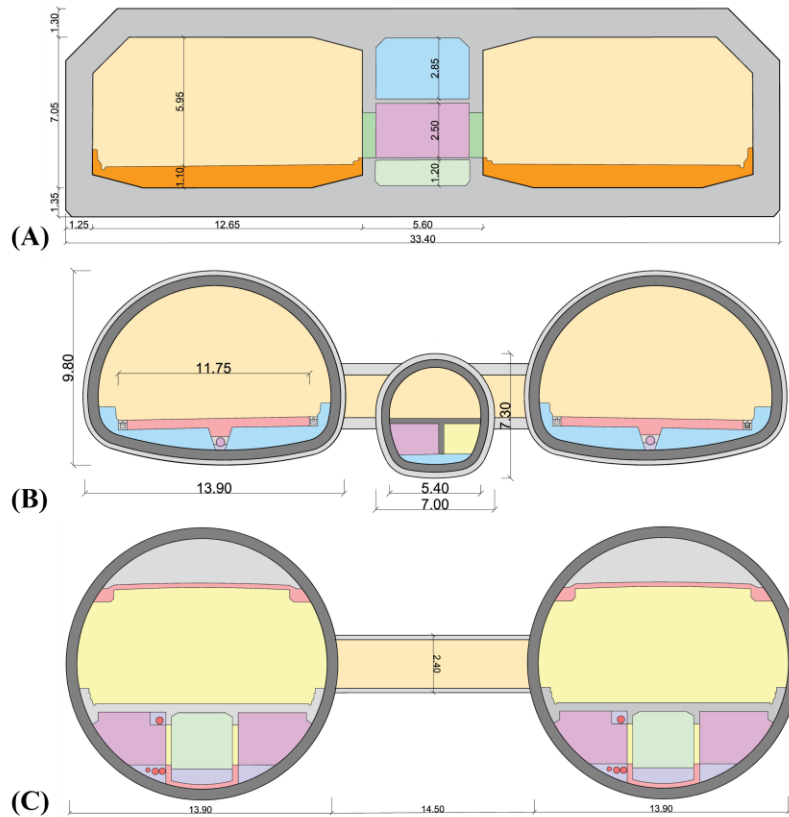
Cross-sections of three types of tunnel: (A) Immersed tunnel; (B) Drill-and-blast tunnel; (C) Shield tunnel.
